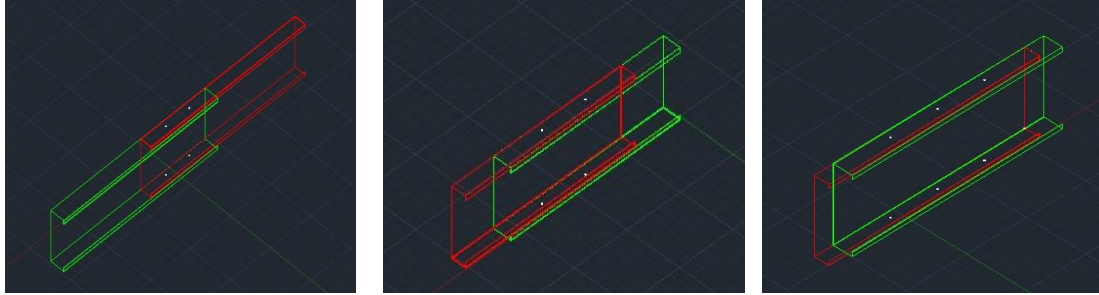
(a) 500mm lap between two sections (b) 750mm lap between two sections (c) 900mm lap between two sections
